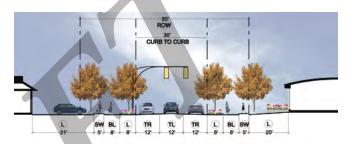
,2.4.20: St. Ferdinand Street, Proposed
